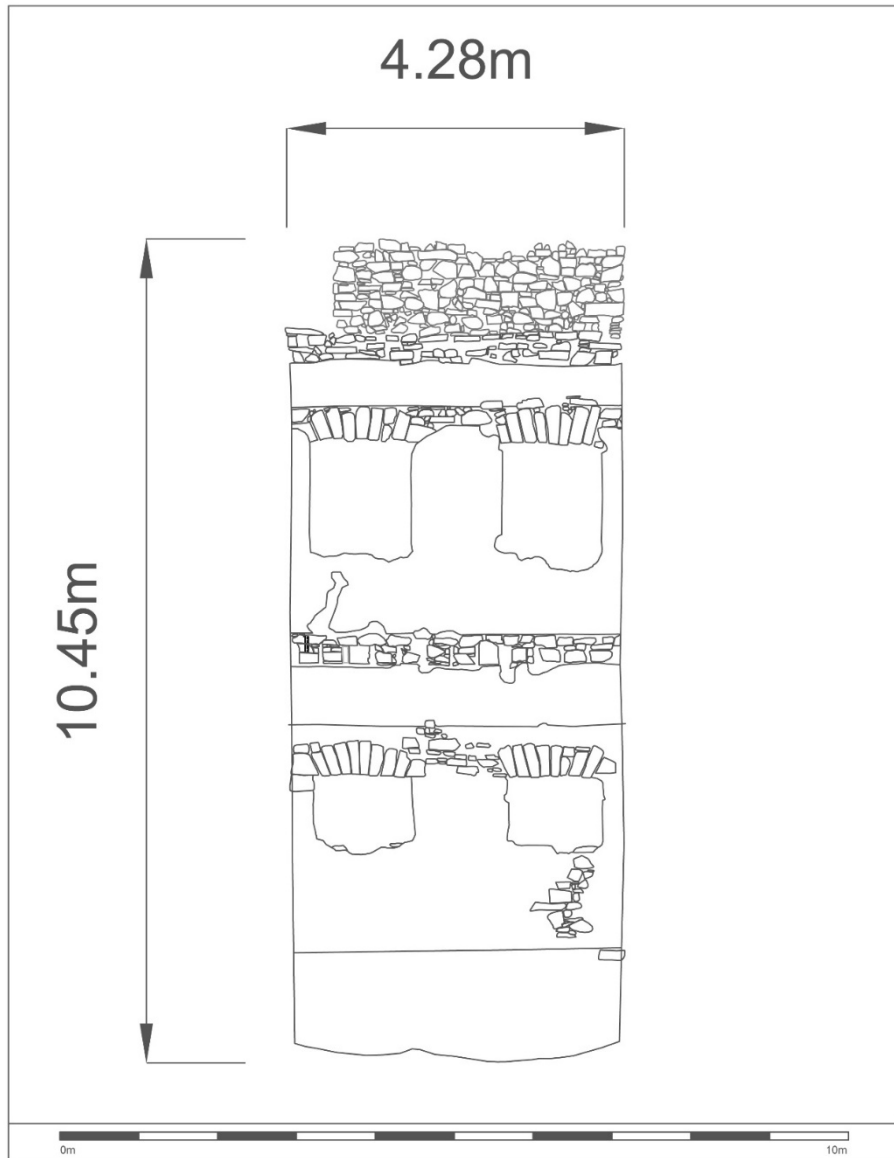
Internal elevation of the north-east wall of the signal tower at Crohy Head Signal Station.
